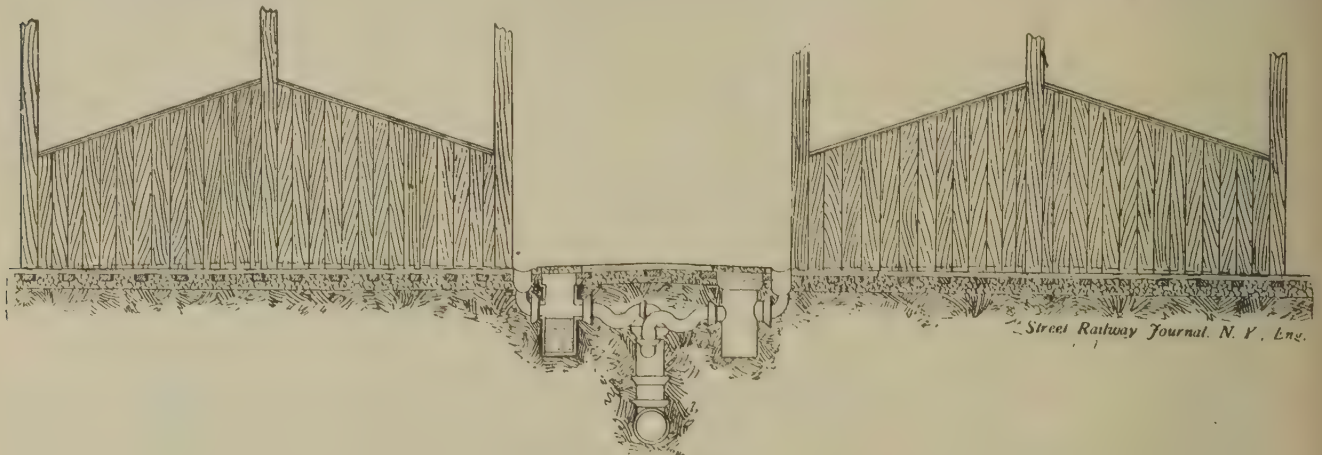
CROSS SECTION, STALLS AND CATCH BASIN IN STABLE.
